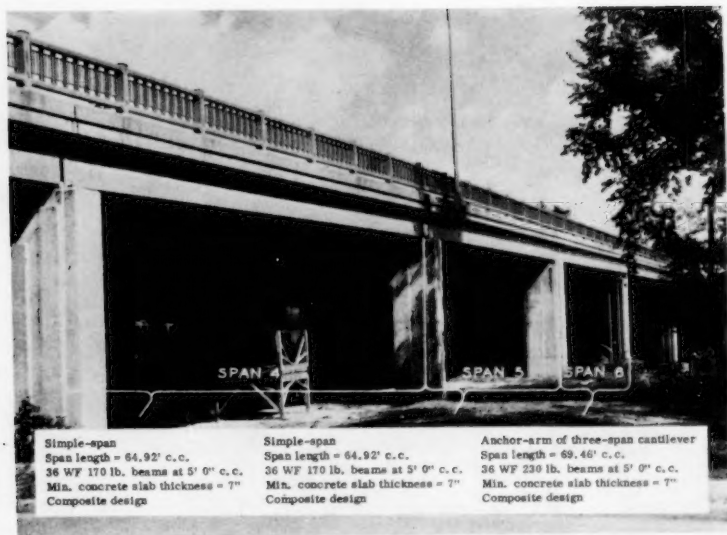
Bridge B1 & B2 of 33-6-4. Main Street in Lansing.
